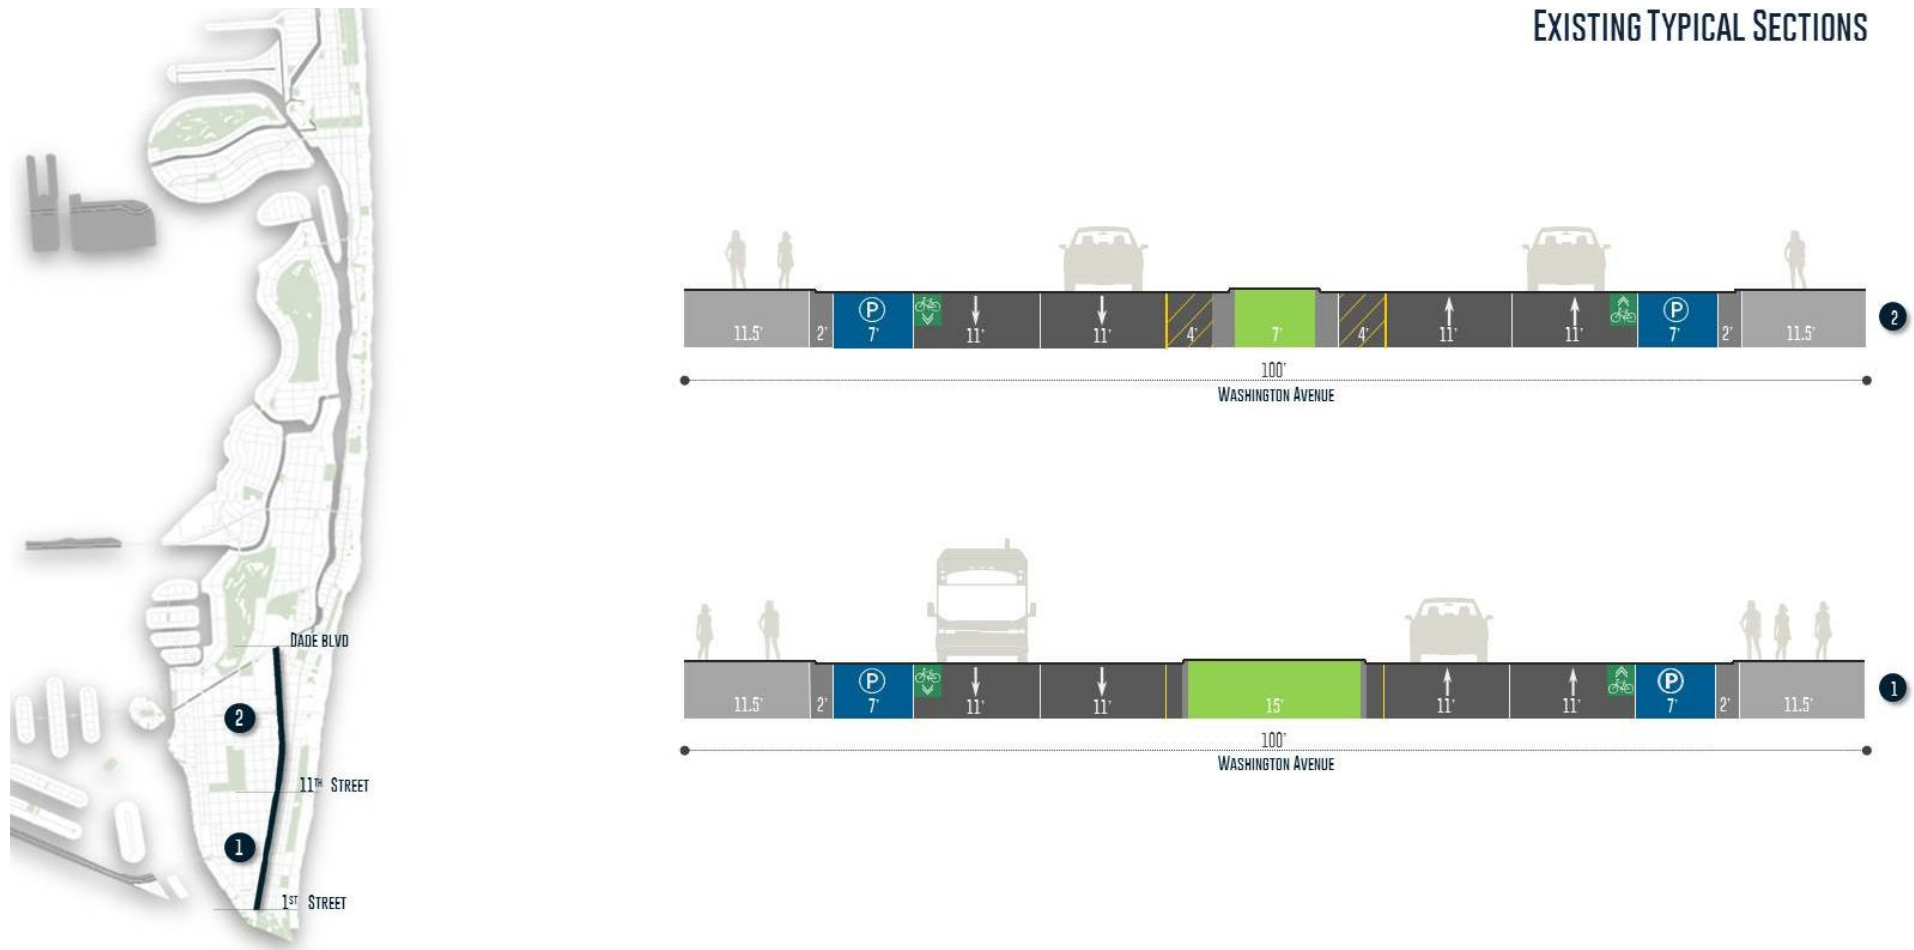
Washington Avenue Corridor Segments and Existing Typical Sections
